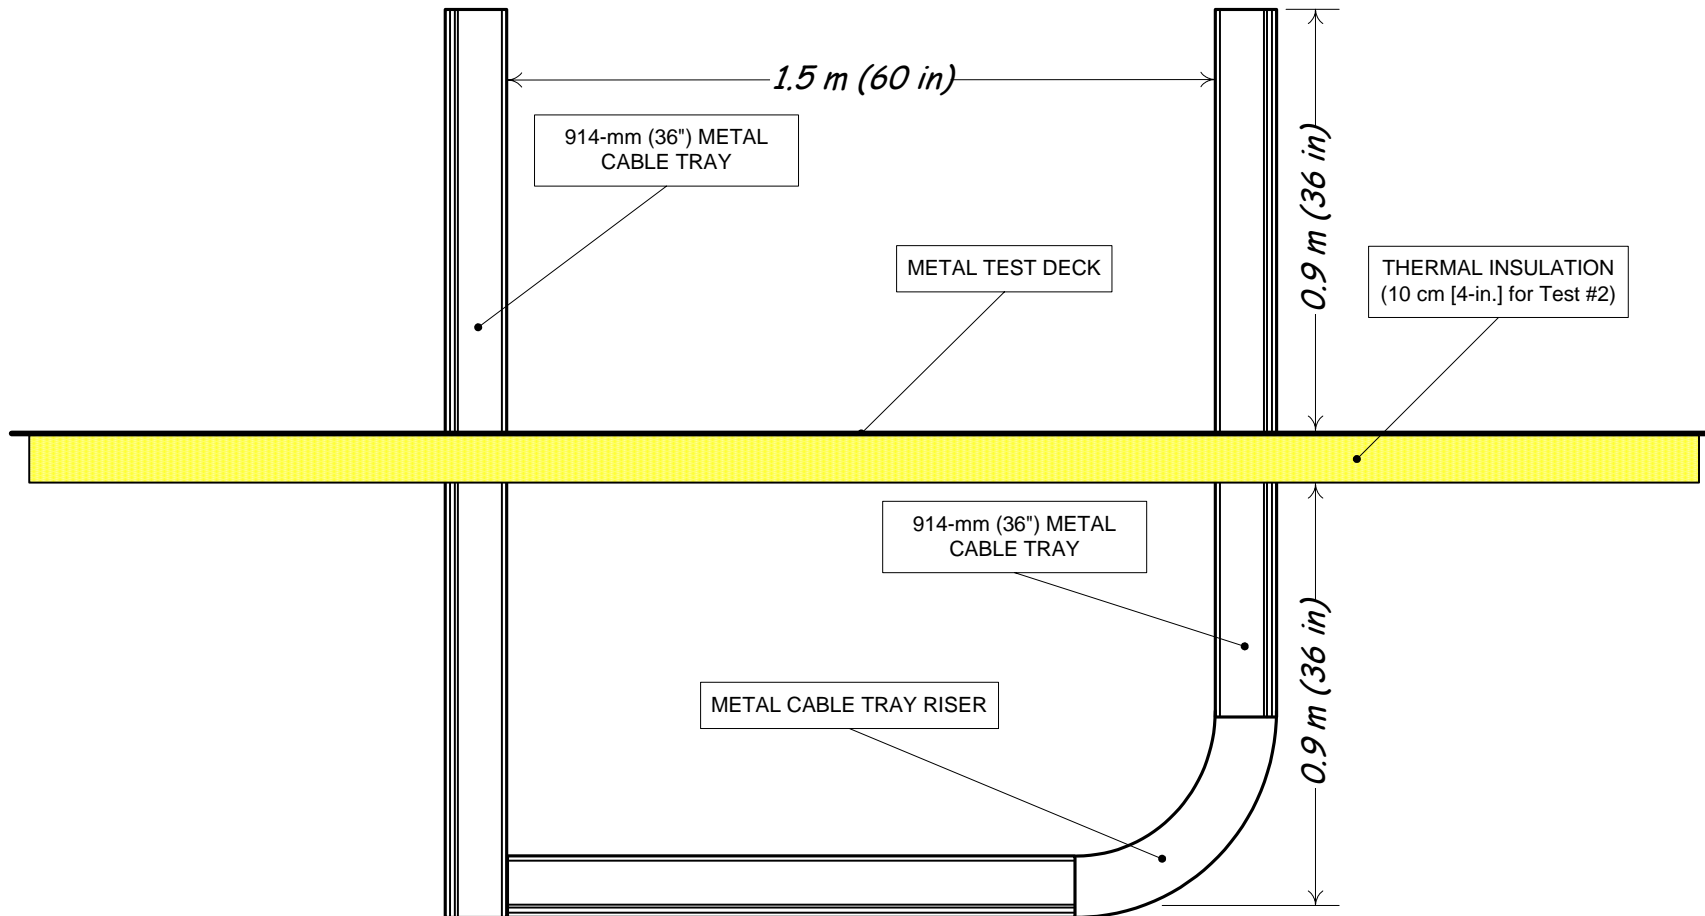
914-mm (36-in) cable tray test specimens (side view with dimensions). Cable trays will be ladder type, 18-gage galvanized steel with 10 cm (4 in) high side rails and 23 cm (9 in) rung spacing.
